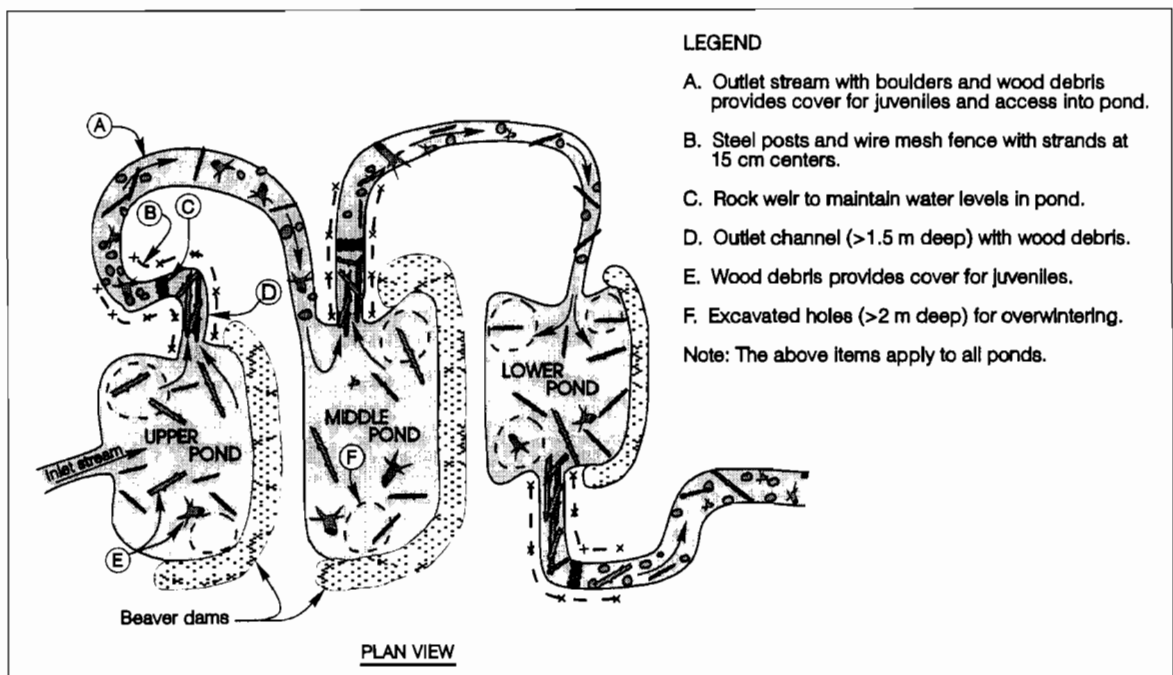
The Telkwa design concept adapted to three beaver ponds.
